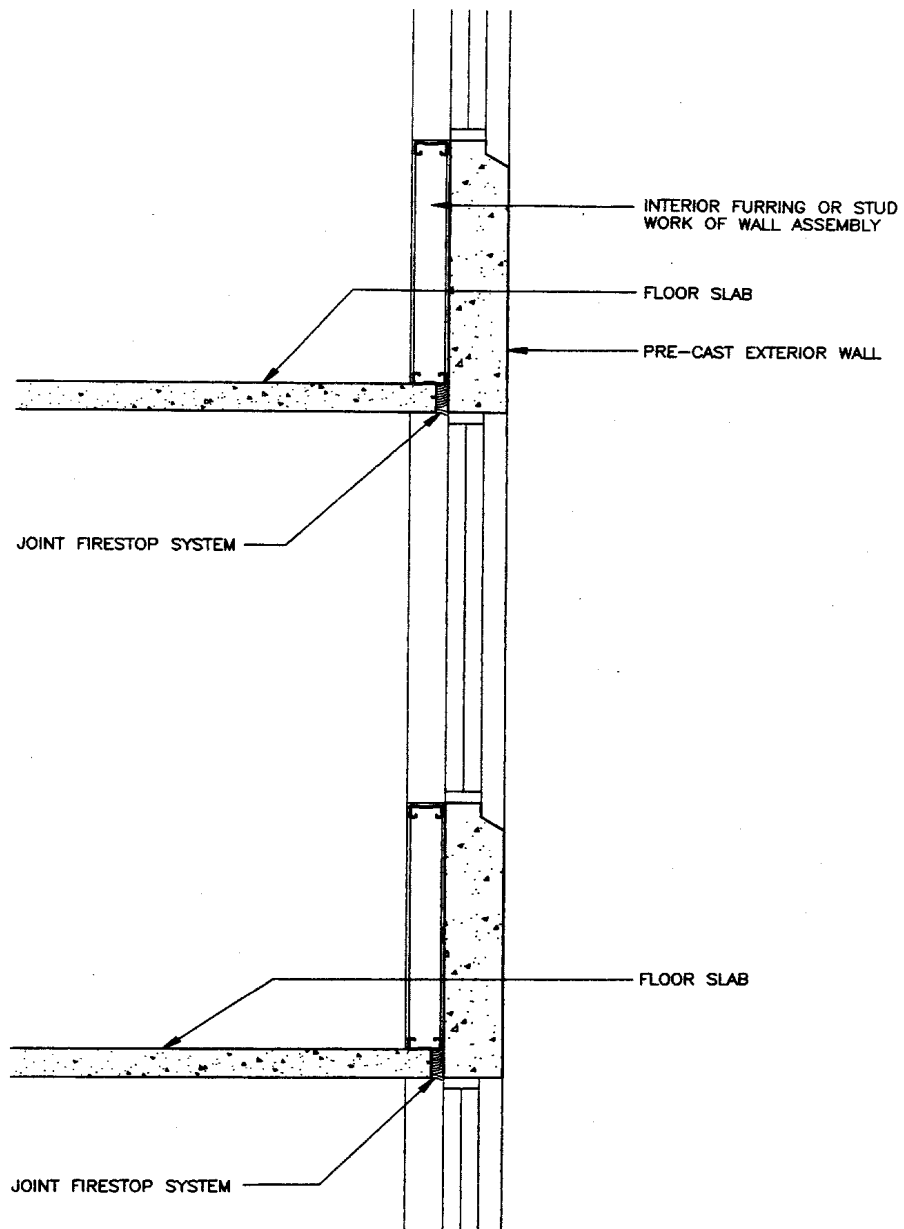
3 JOINT FIRE STOP—TYPICAL WALL SECTION
